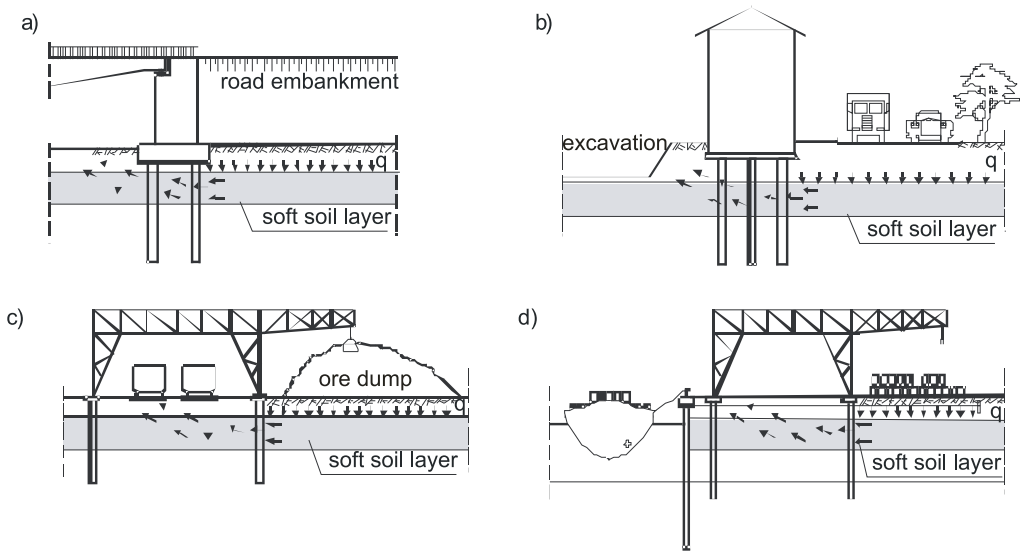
Examples of lateral earth pressure induced by soft soil layer acting against the piles due to unsymmetrical subsoil loading: a) road embankment, b) excavation near the building on piles, c, d) dumping of the materials near crane railway subgrade
